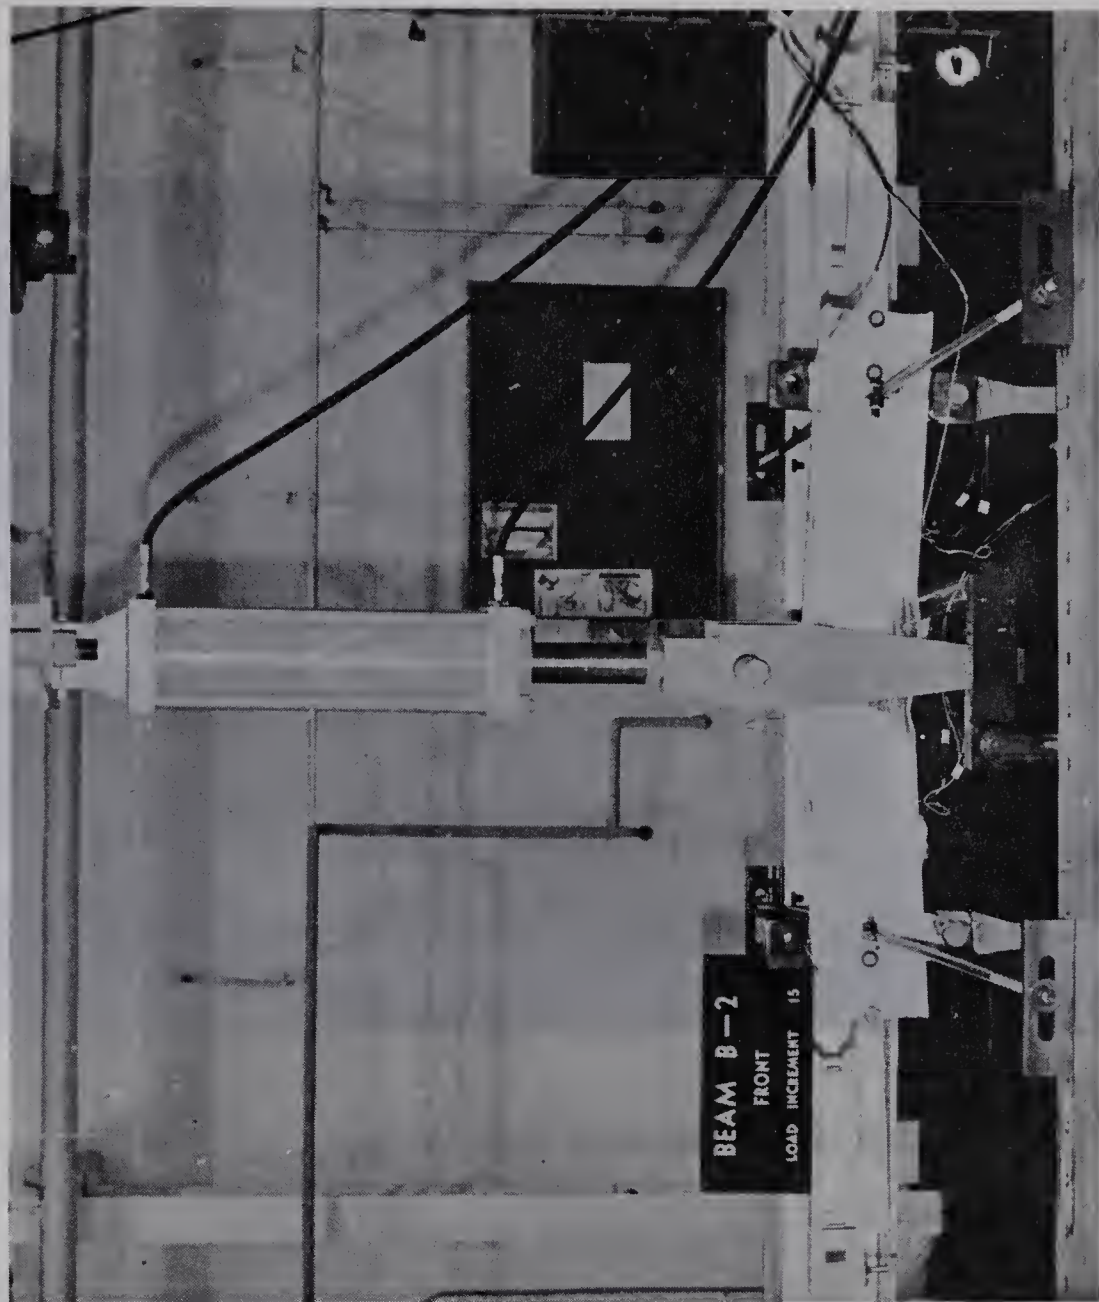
TEST SETUP - TOP FRONT VIEW
